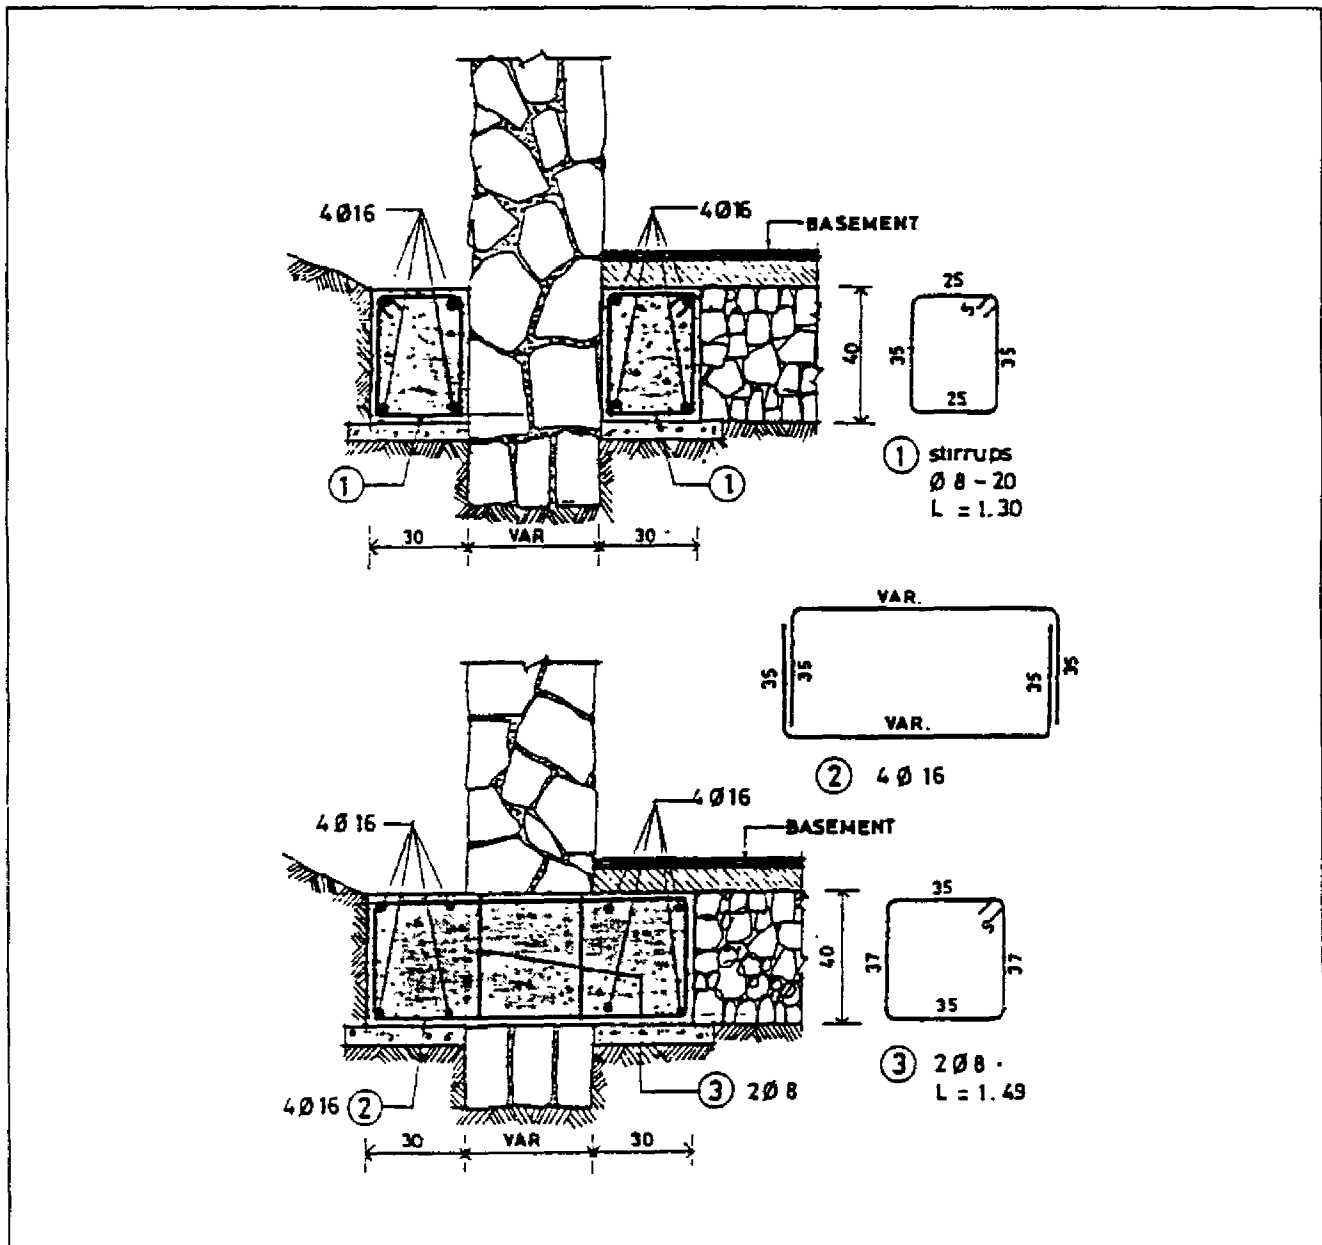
Strengthening Existing Foundation (R.C. Strip on Both Side)
